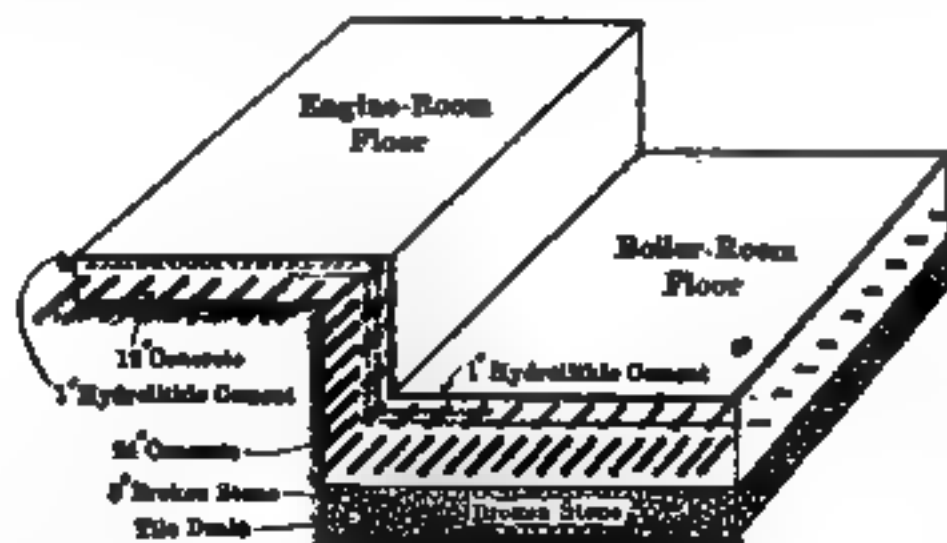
\* Reinforced-concrete Floor with Water-proof Cement
